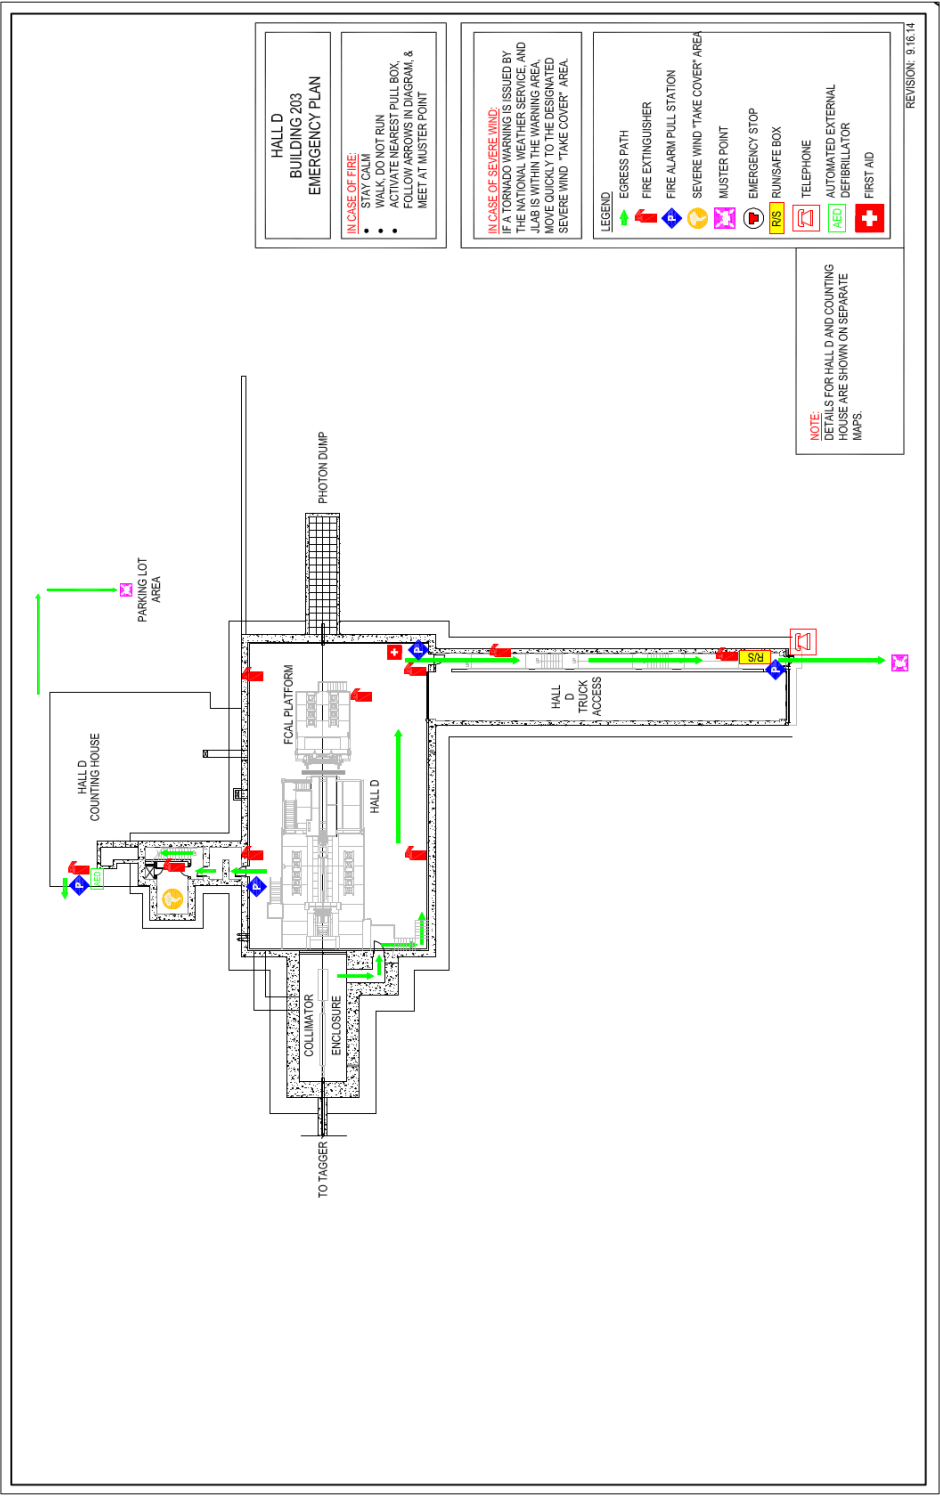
Layout of the Hall D counting house indicating safety equipment and emergency plan.
